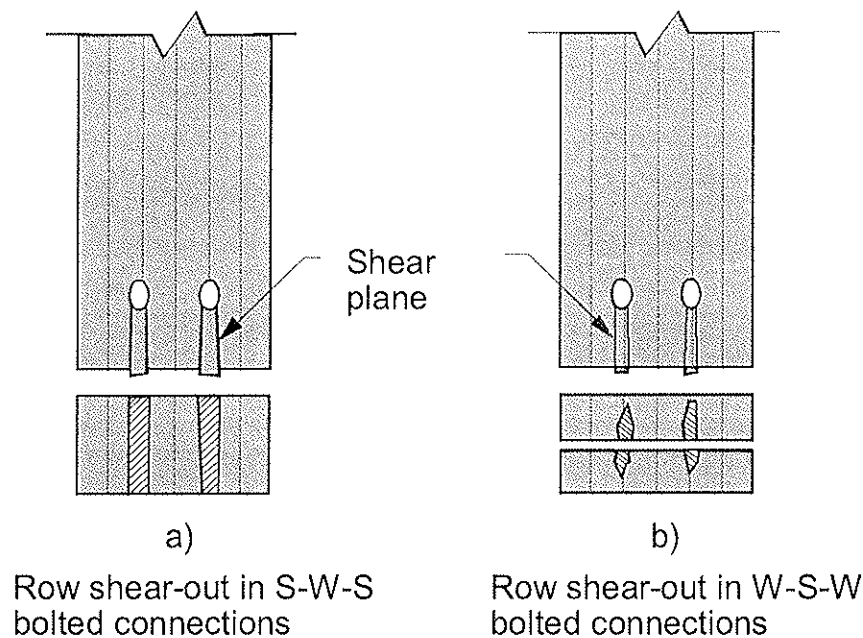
Typical row shear-out failure in bolted steel-wood-steel or wood-steel-wood connections.
